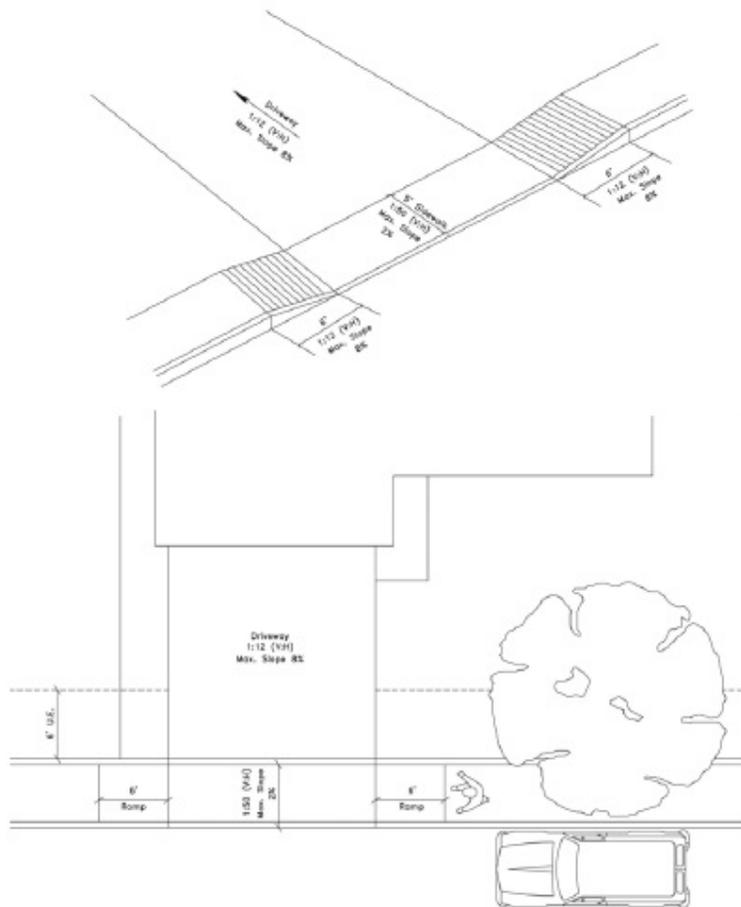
Typical Cross Section Handicapped Accessible Driveway
